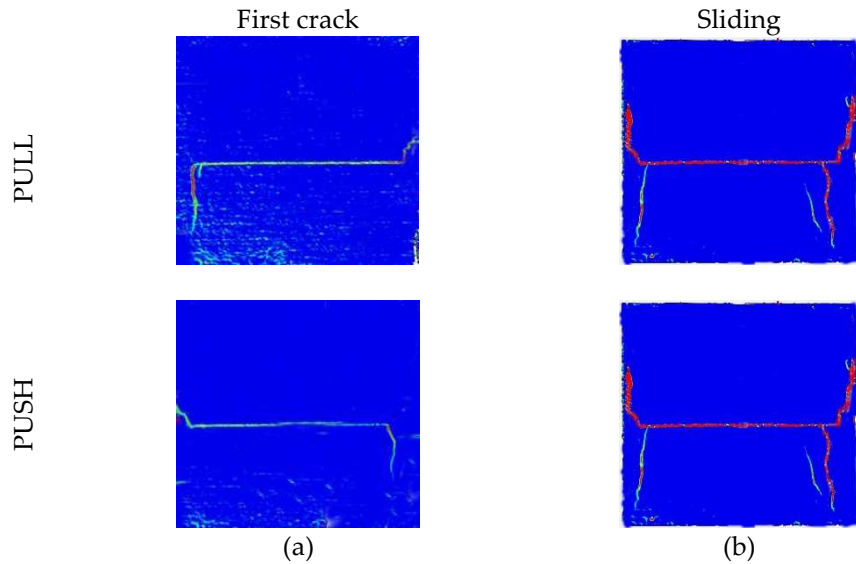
Crack pattern detected with digital image correlation: (a) first crack and (b) sliding.
